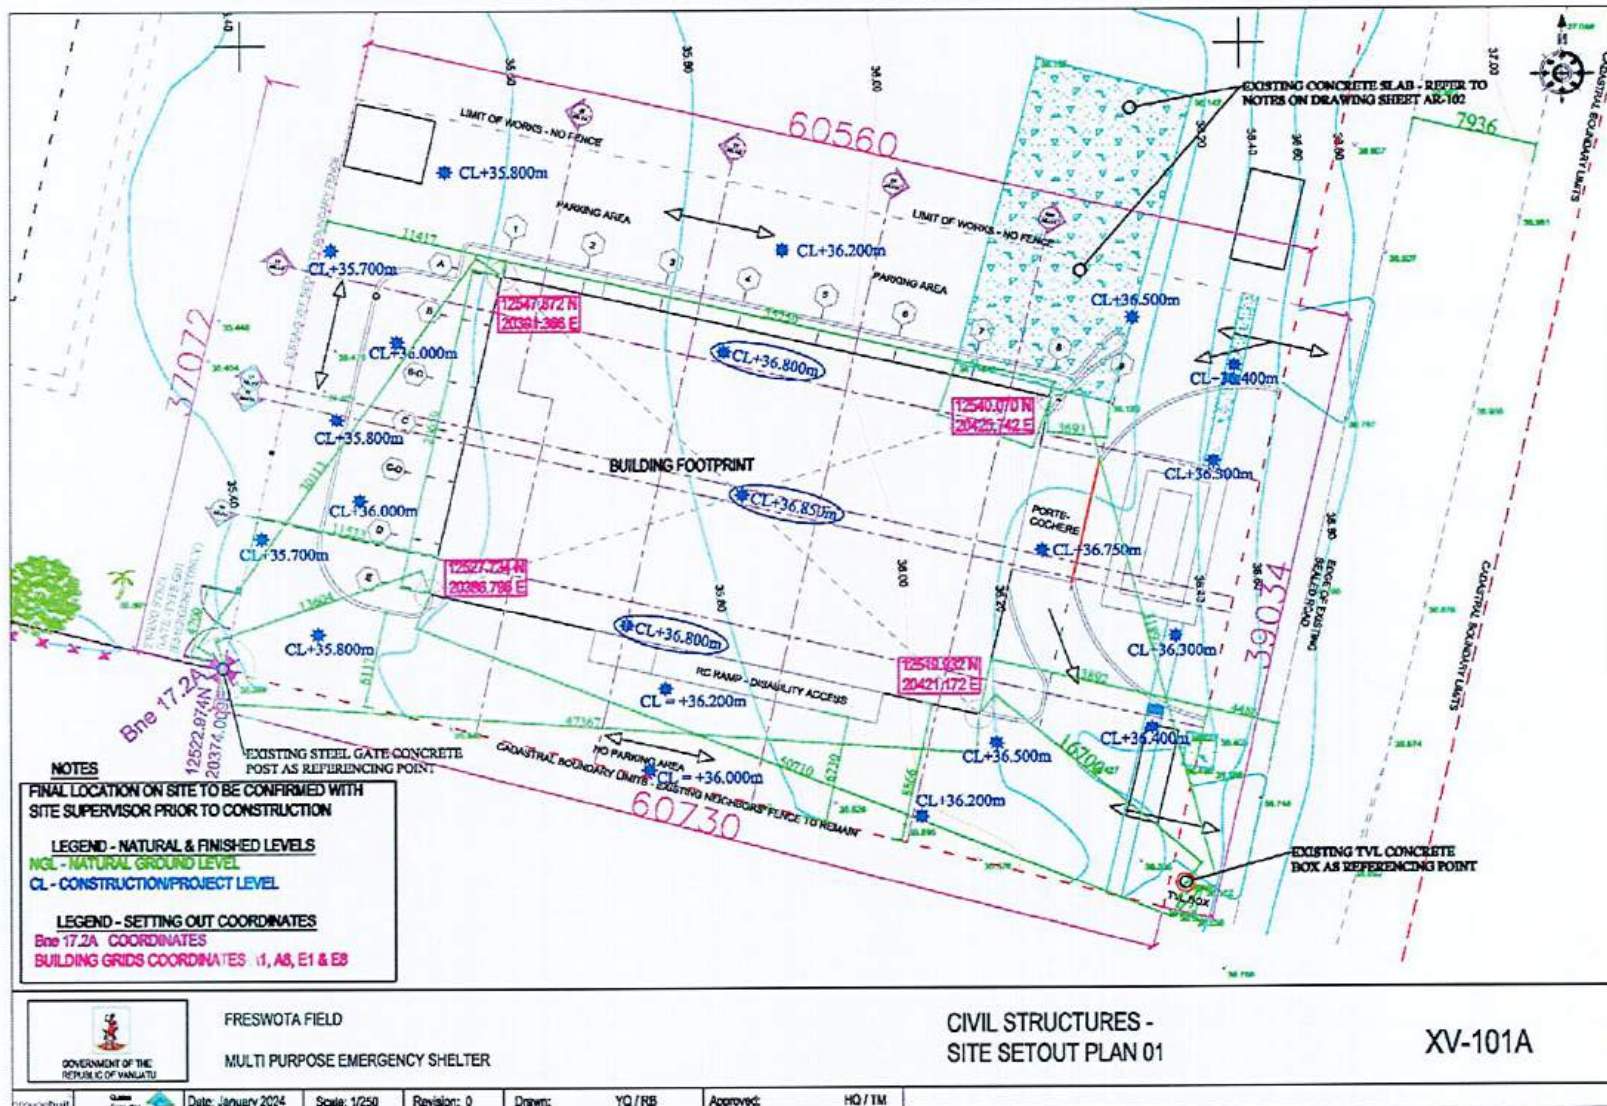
Korman - Civil structure site setout plan showing the main elevation of the construction
